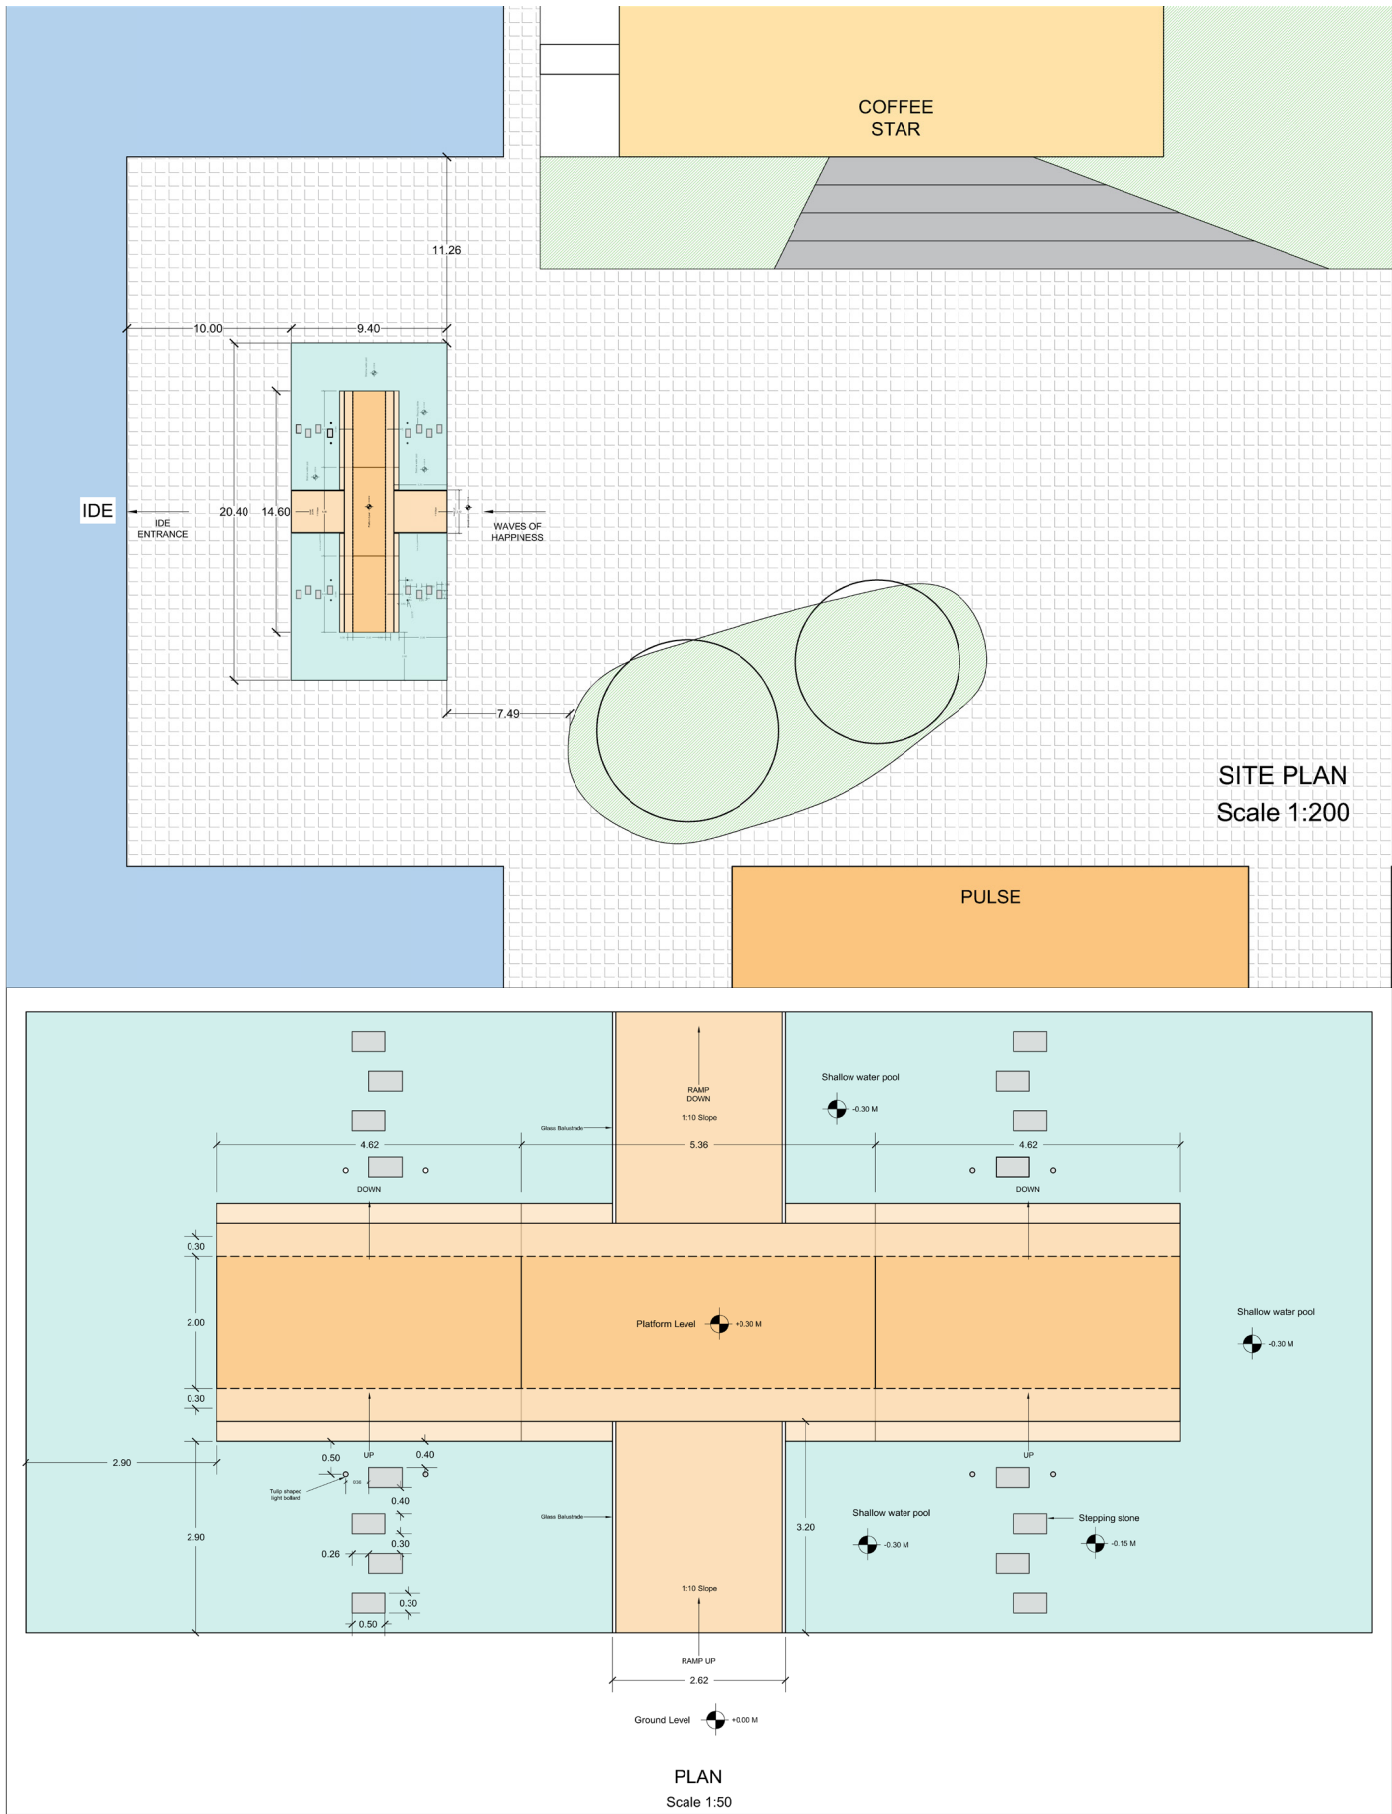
Revised Site Plan and Architectural Plan of the design. Please see the appendix for more details.
